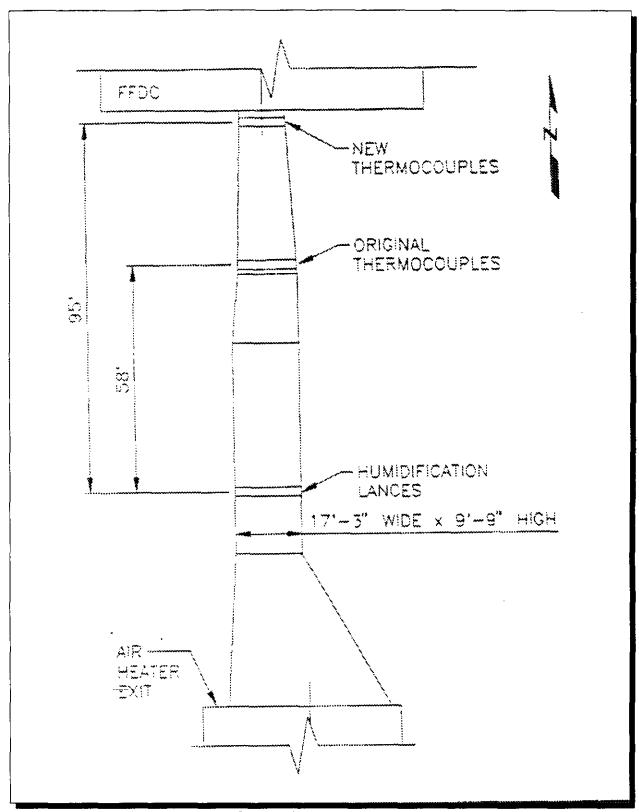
Plant Layout of Flue-Gas Humidification System
